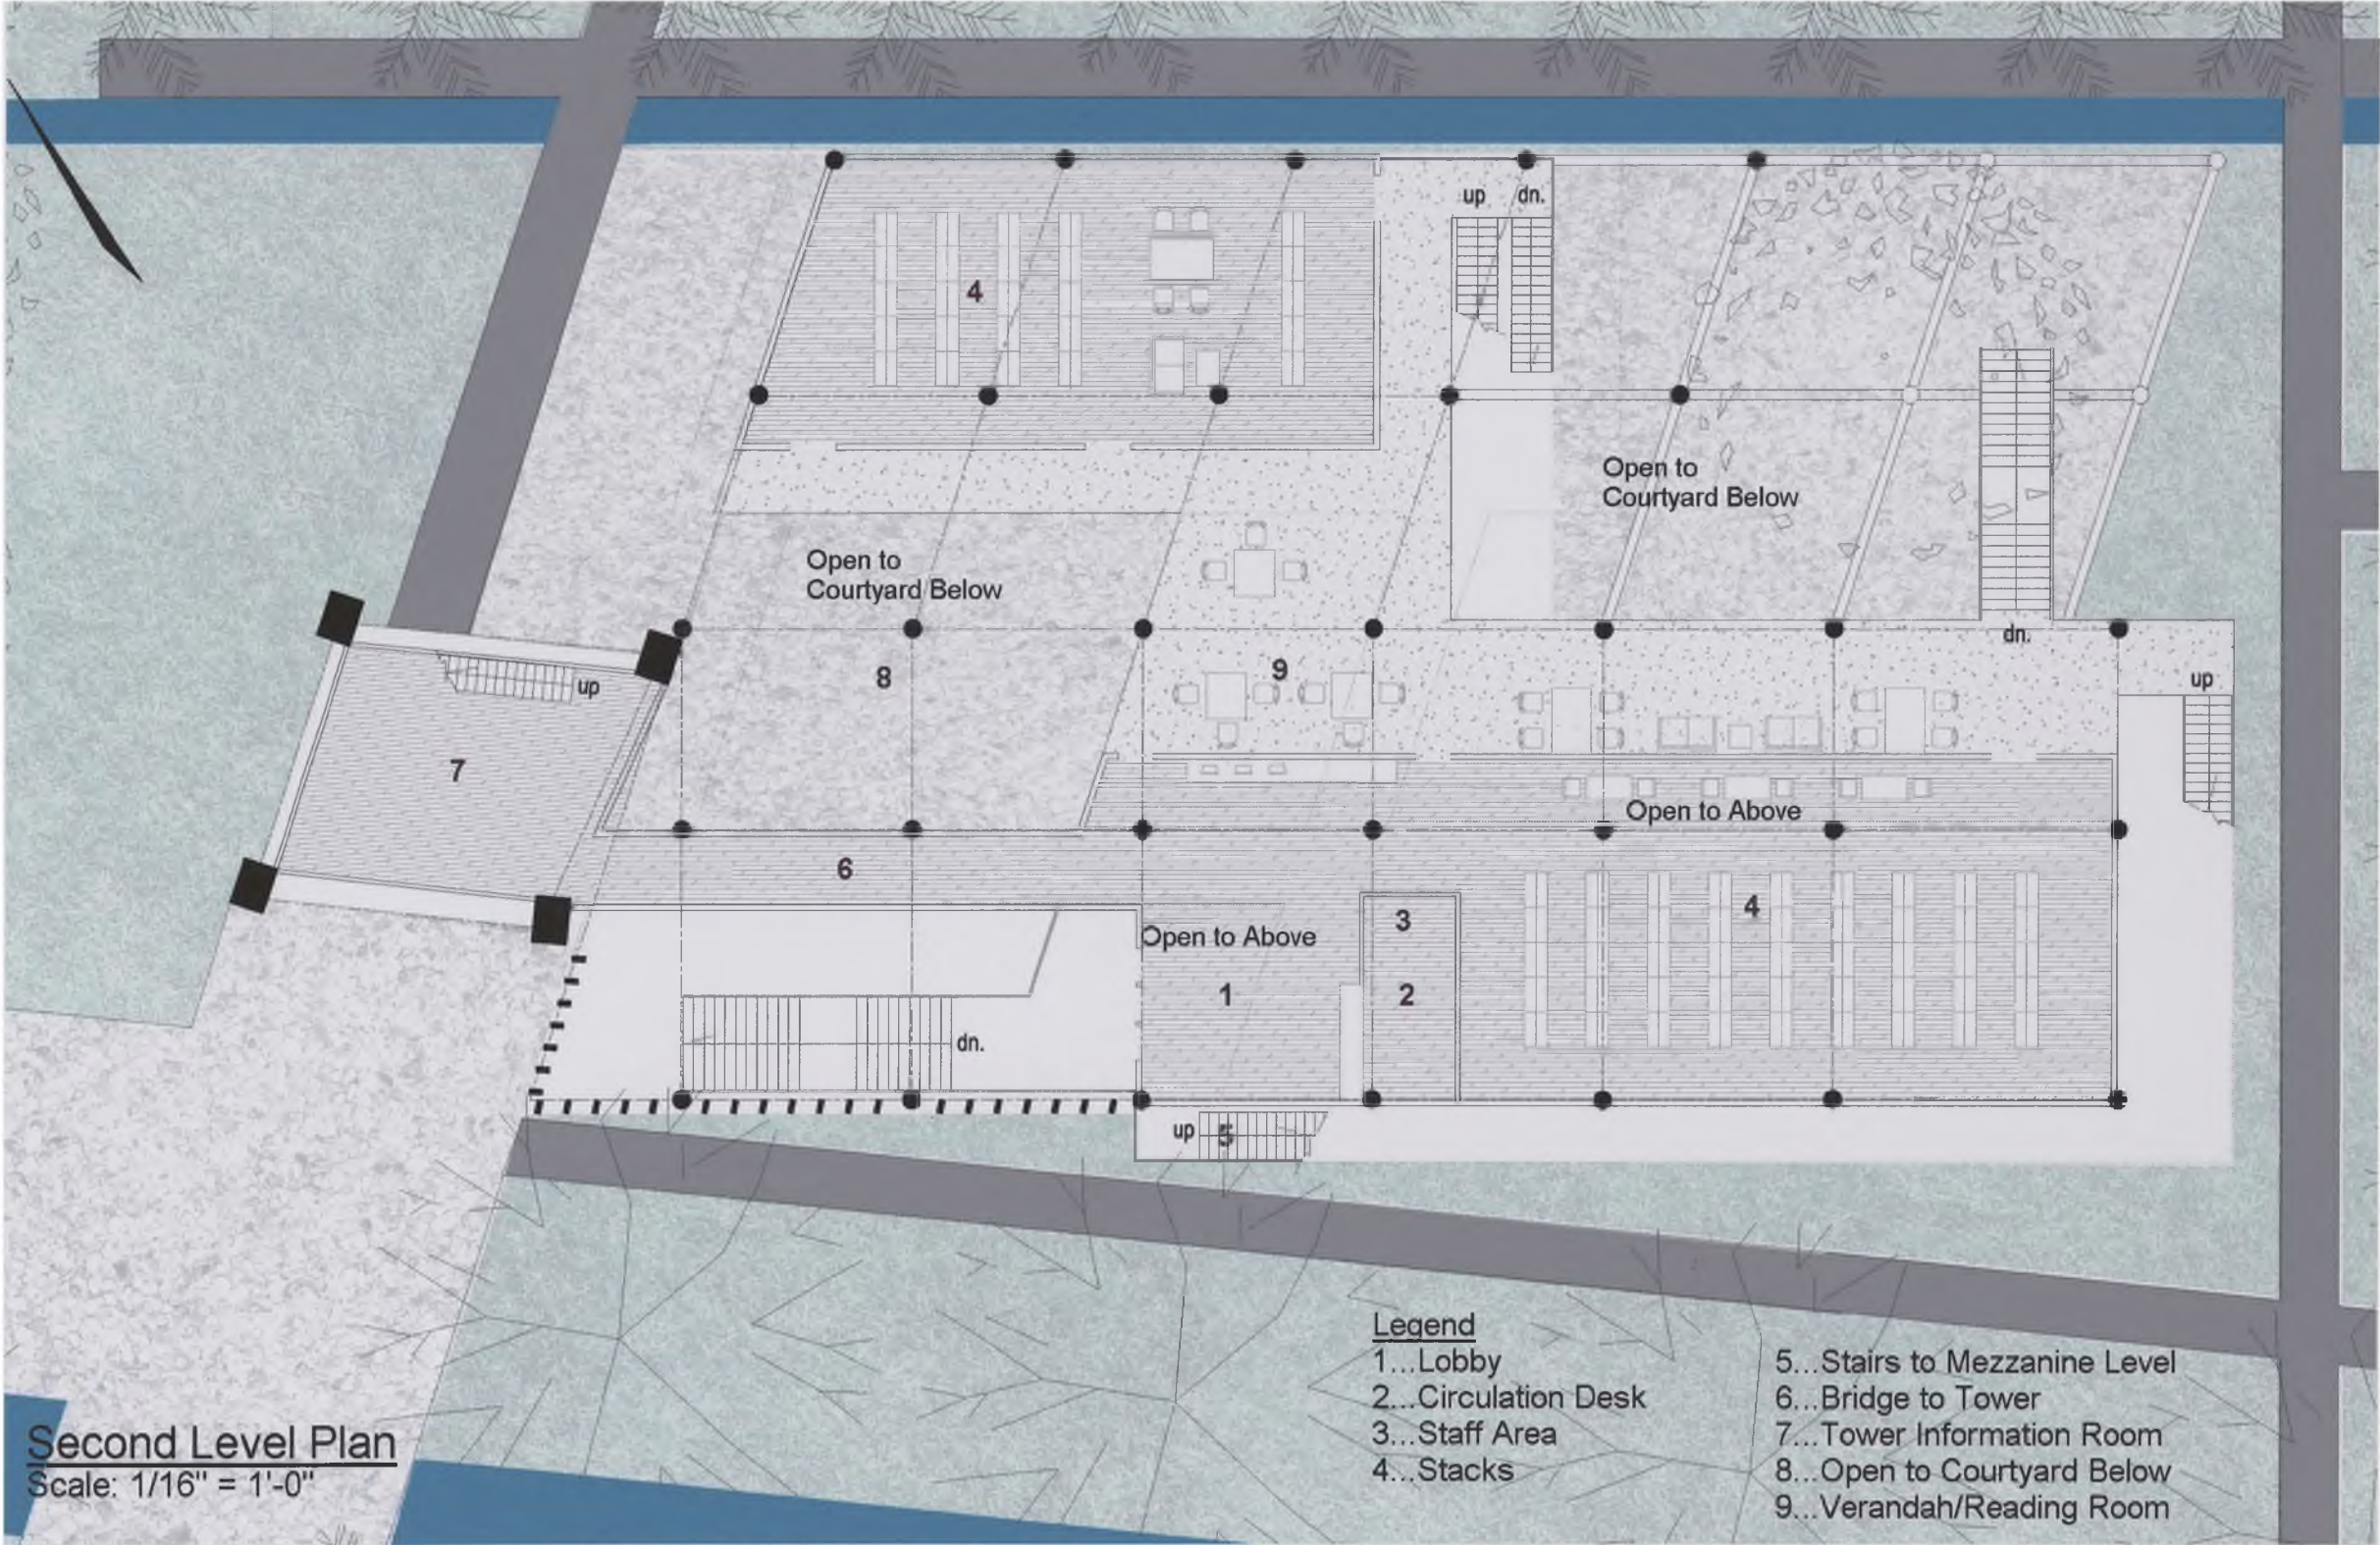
Plan 02-entry to Library via stairs open to triple height space. Verandah reading rooms overlook the courtyards below.
